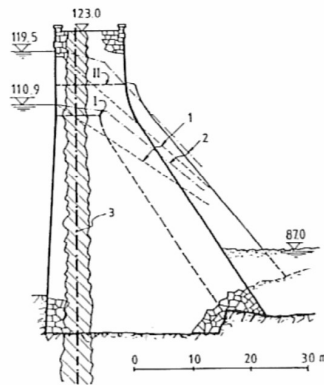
Typical cross section of Aswan Dam and the position of curtain grout: I and II dam construction phases, 1 linear distribution of uplift pressure in the foundation plane, 2 uplift pressures measured in piezometers, 3 center line of grout curtain.
